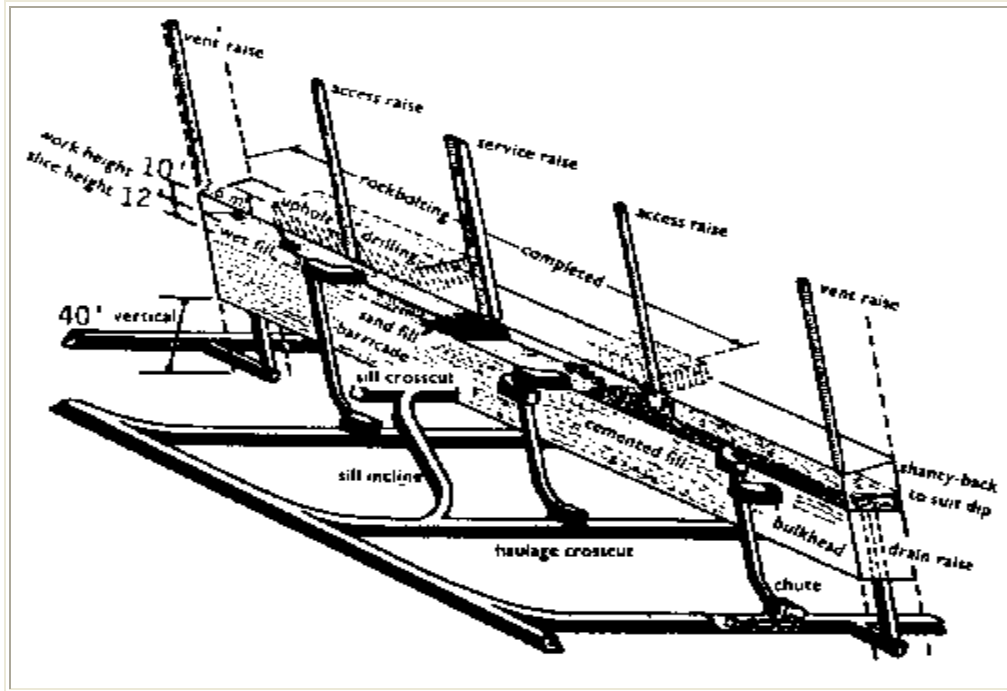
Isometric view of mechanized cut-and-fill stope
